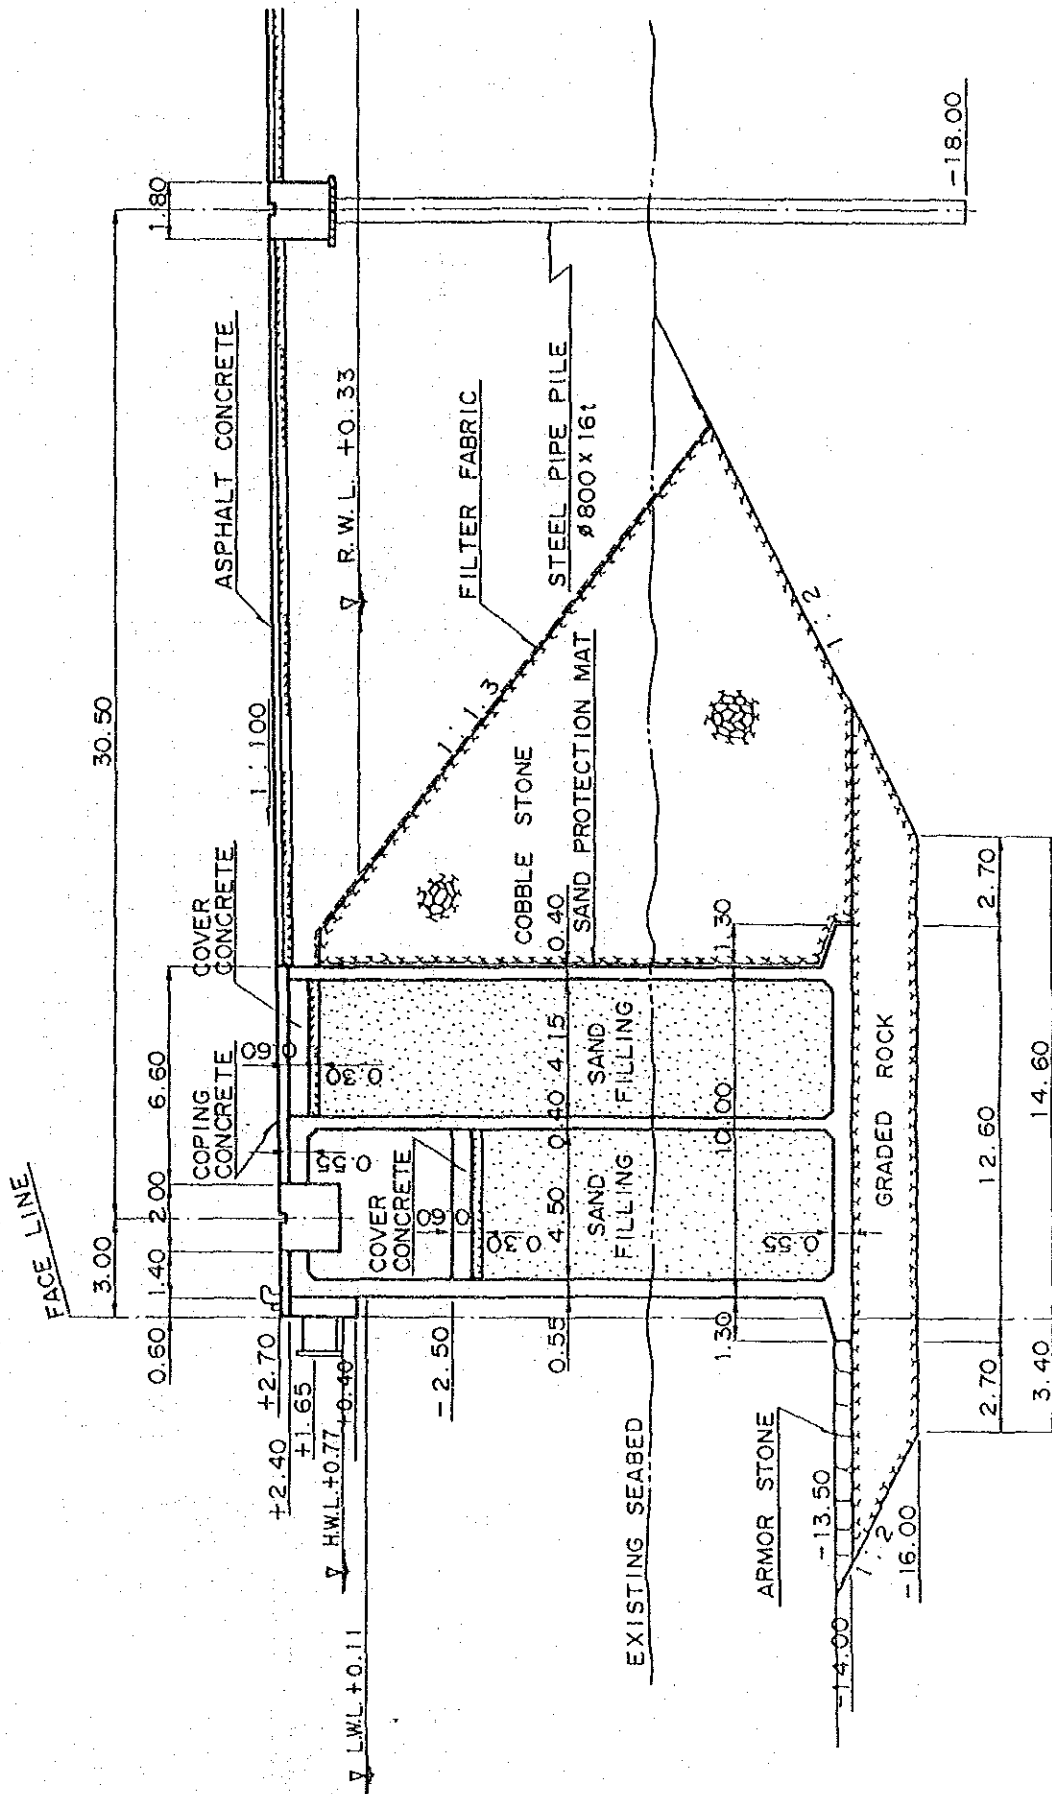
Typical Cross Section of JCT -13.5 m Quaywall
